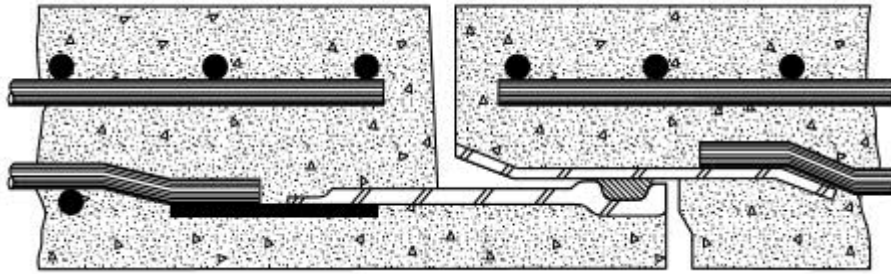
Steel End Ring Joint with Spigot Groove and O-Ring gasket
